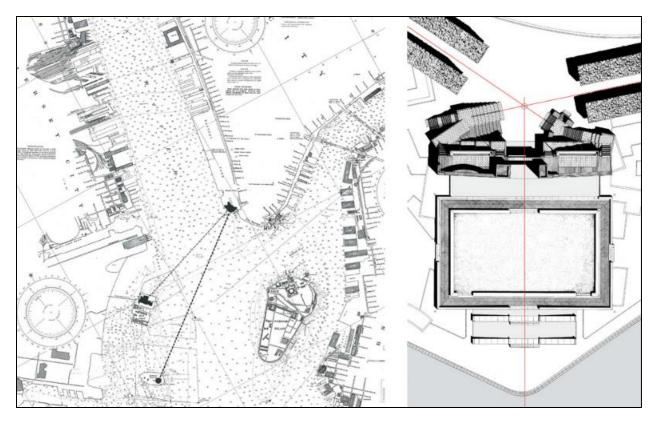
Park Structure Source: Machado Silvetti, 2017
